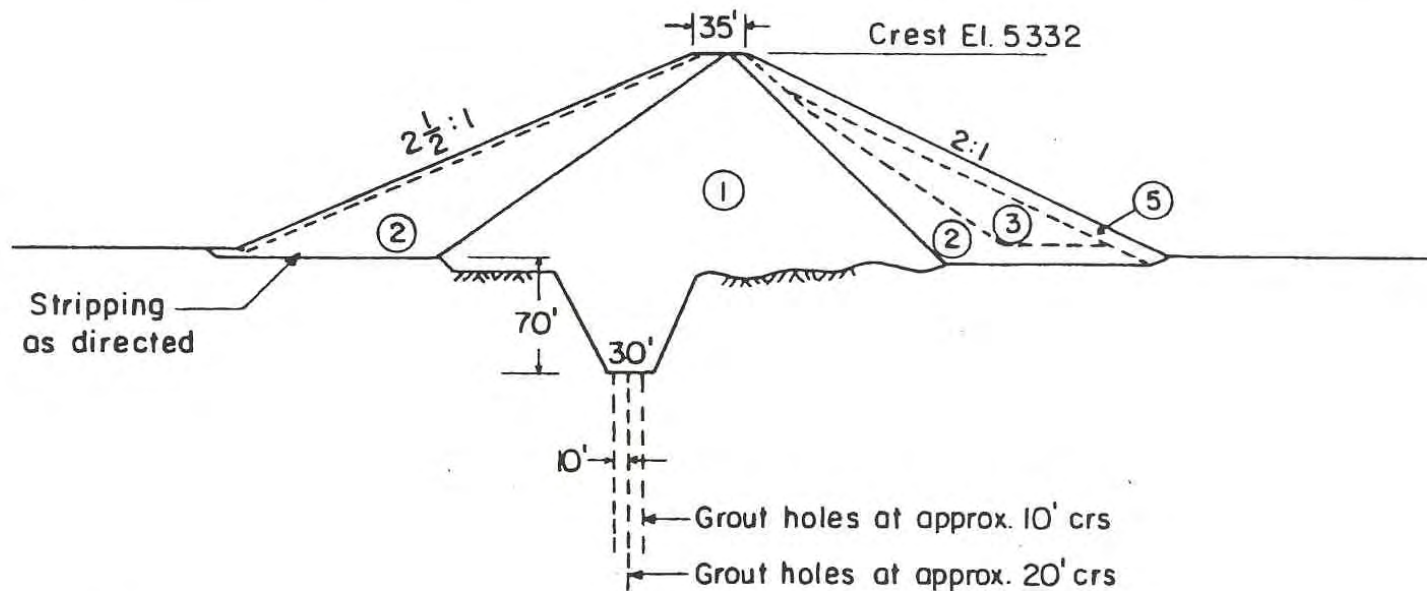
Typical cross-section over abutment sections founded on jointed rhyolite.
